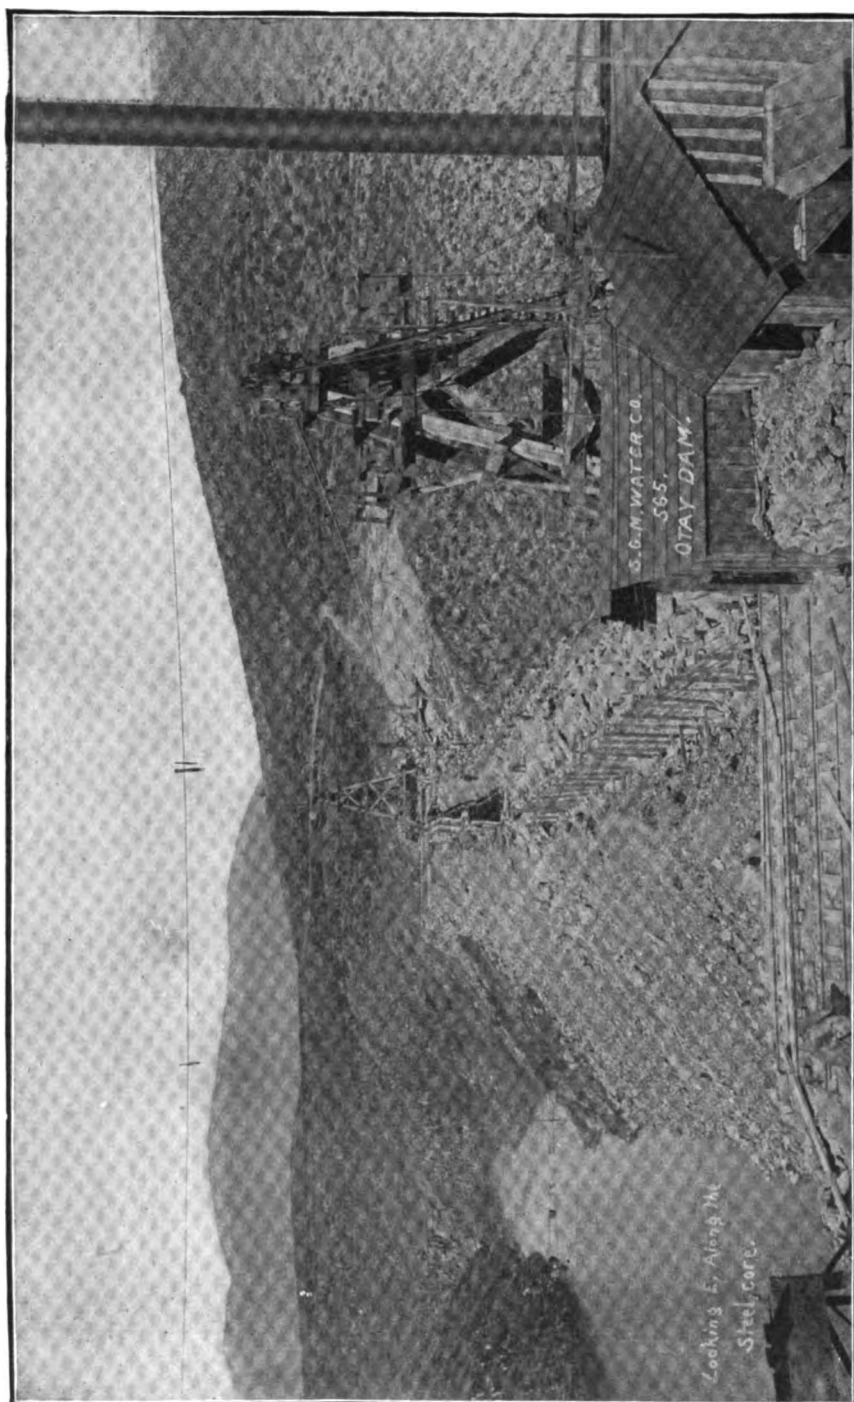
OTAY (CAL.) ROCK-FILL DAM—STEEL CORE.
